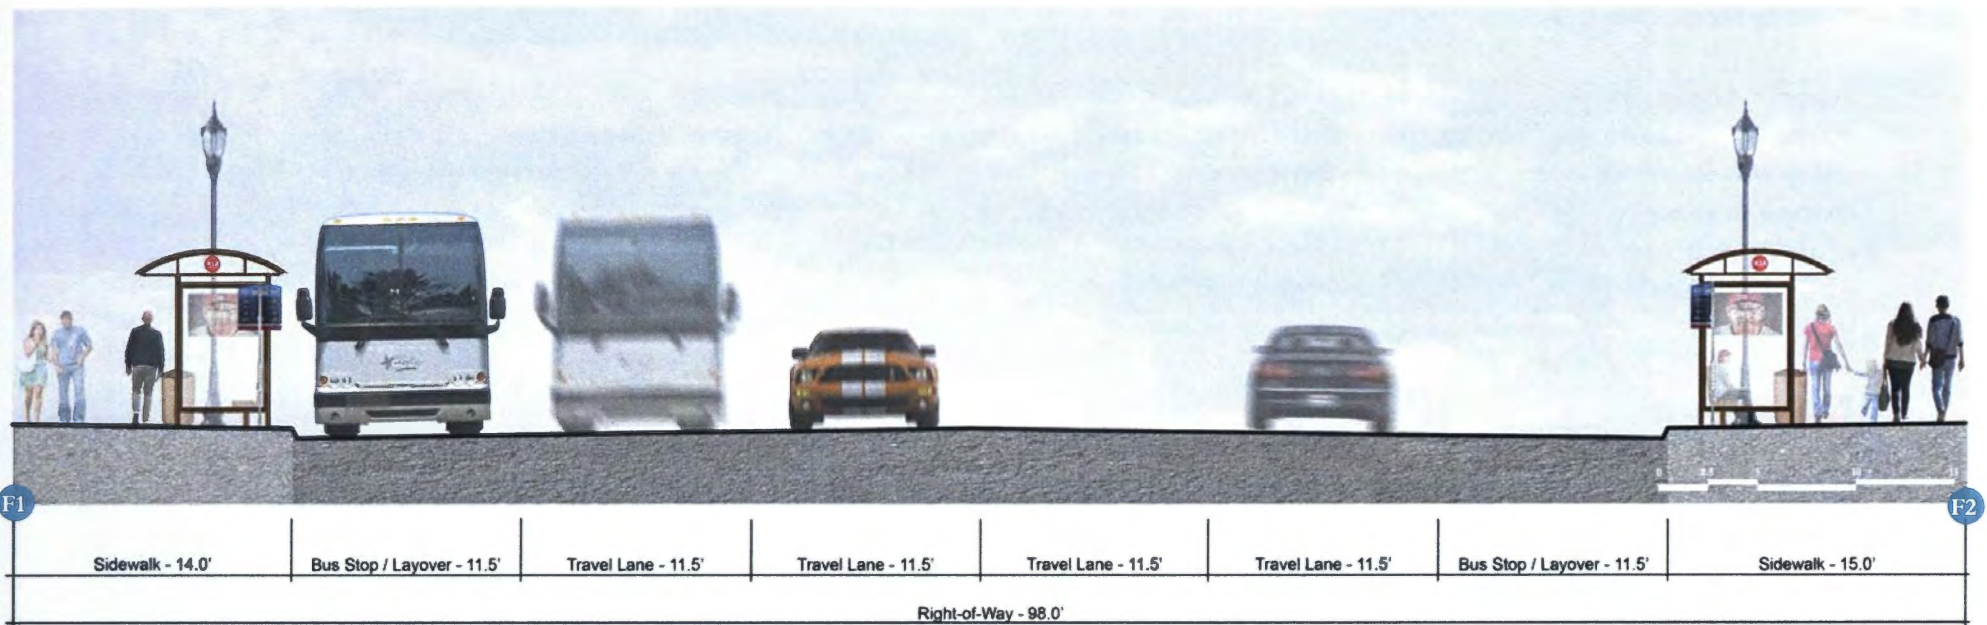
Prospect Avenue between West 3rd and 6th Street Existing Section
